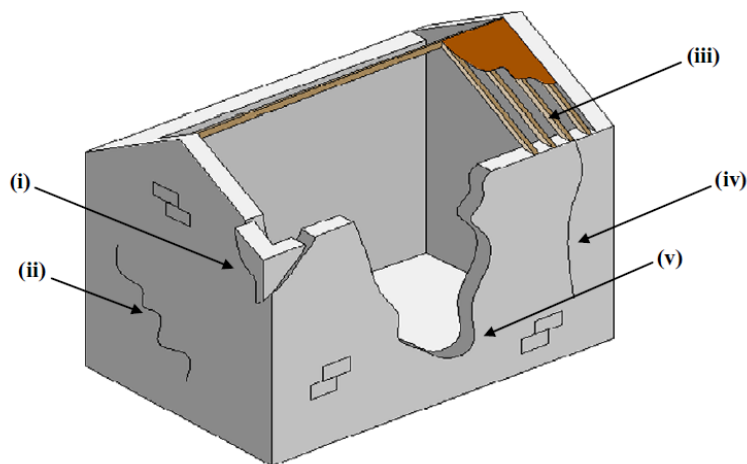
Failure Mechanisms of a Typical Adobe Structure ([Bhattacharya et al., 2014](#))
